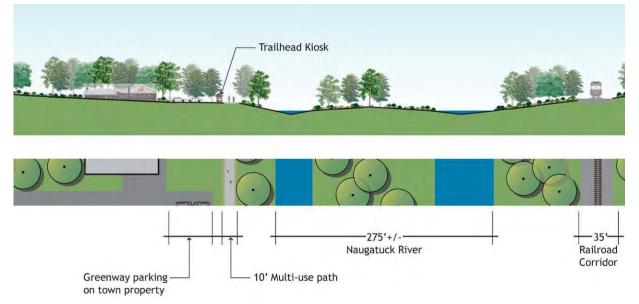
Site cross-section showing the recommended greenway alignment adjacent to the commercial properties between the river and South Main Street at far left.
